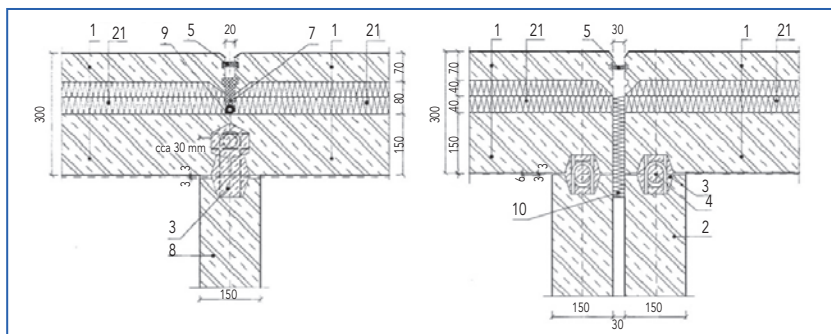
Plan view of multi-family house wall type P 1.14 (left – contact of peripheral panels, right - dilatation of row sections), [9].
